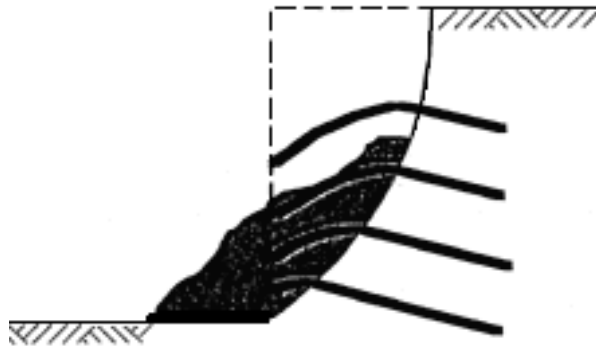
Failure due to excessive height of continuous excavation[20]
